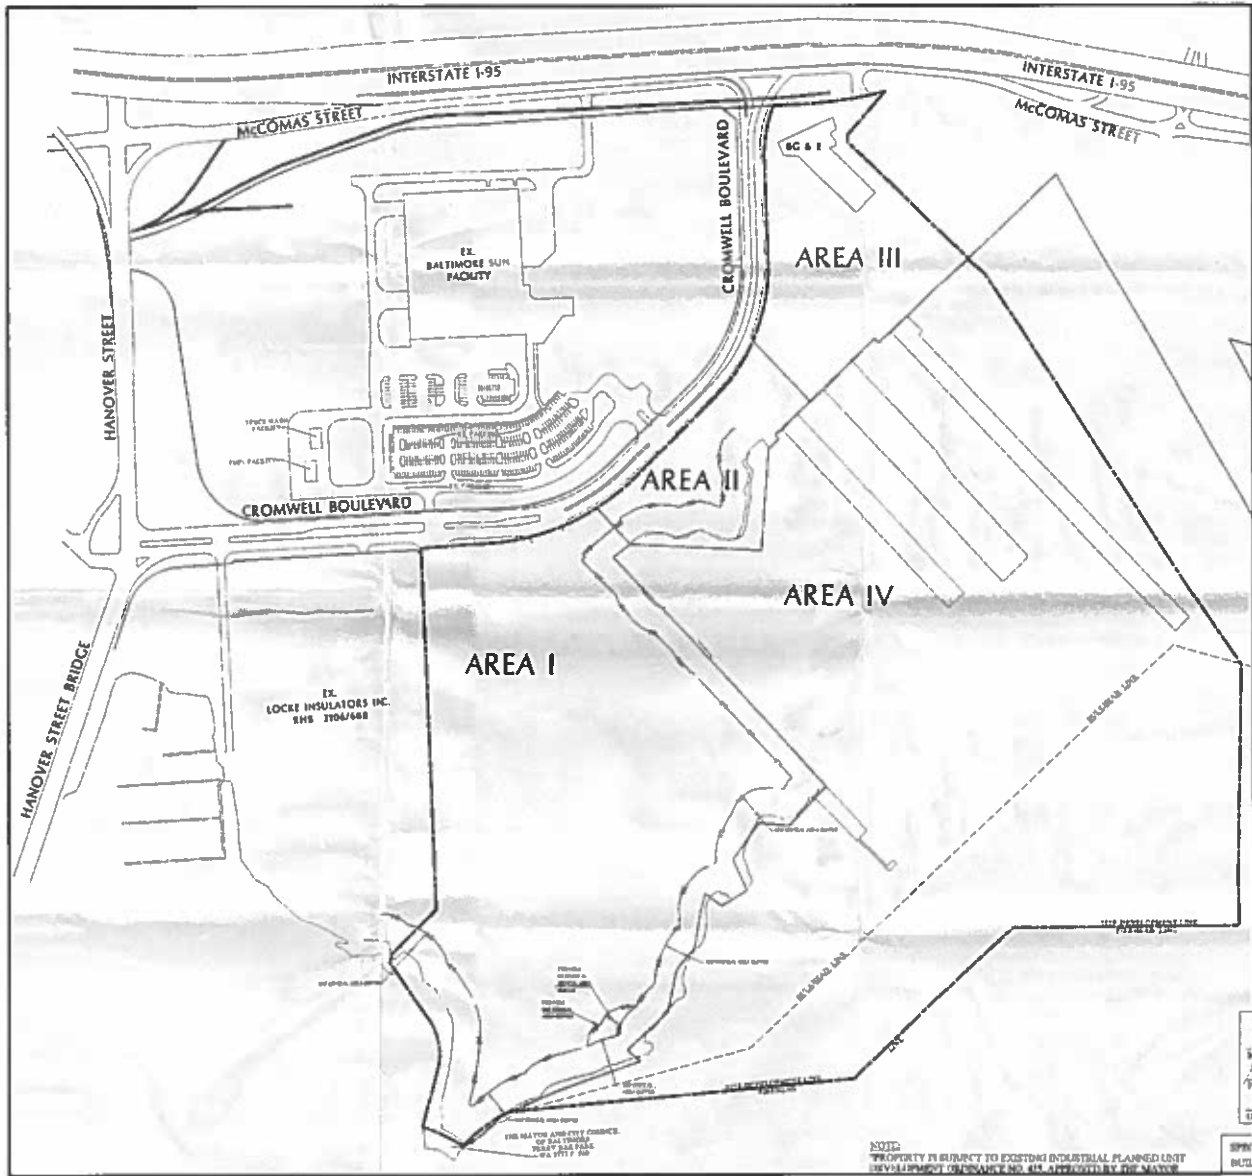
Proposed Site Plan for Subject Portion of Areas II and III
